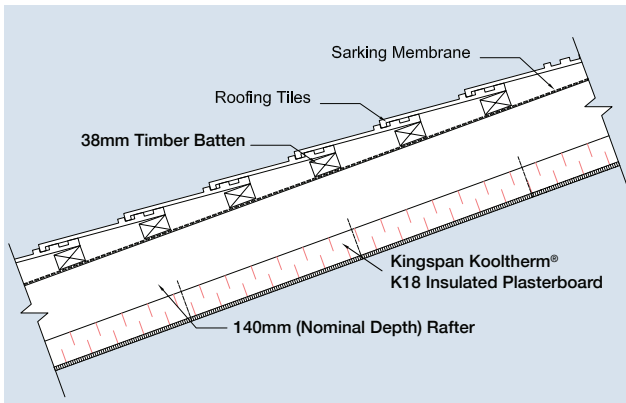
Side elevation - Raked ceiling with Kingspan Kooltherm® K18 Insulated Plasterboard
